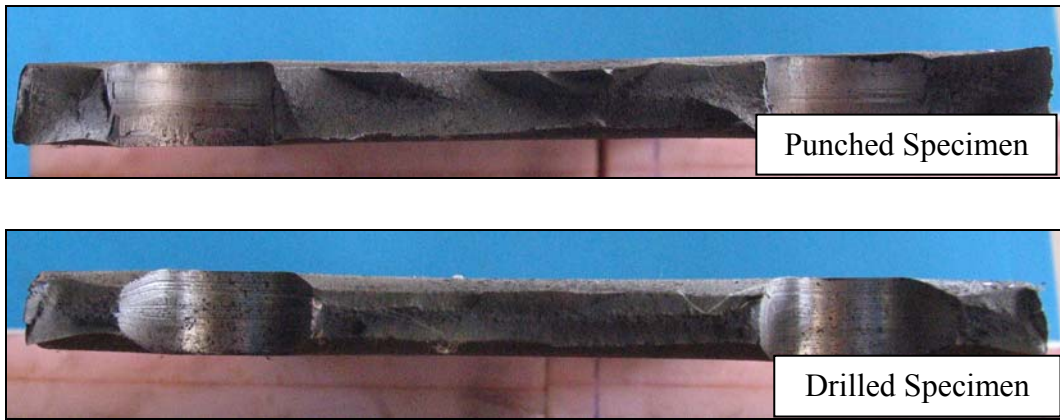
Typical Punched and Drilled Hole Fracture Cross-Sections (3/8 Inch Thickness, 15/16 Inch Diameter Hole, Grade 50)
